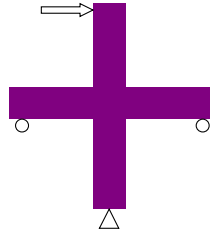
Typical loading set-up of beam-column joint sub-assemblage.
